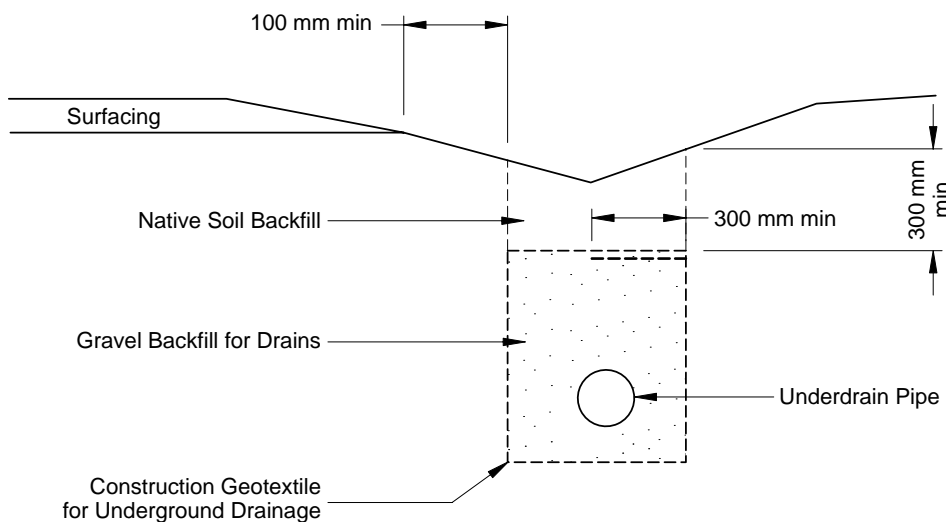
Geotextile Wrapped Pavement Under Drain
